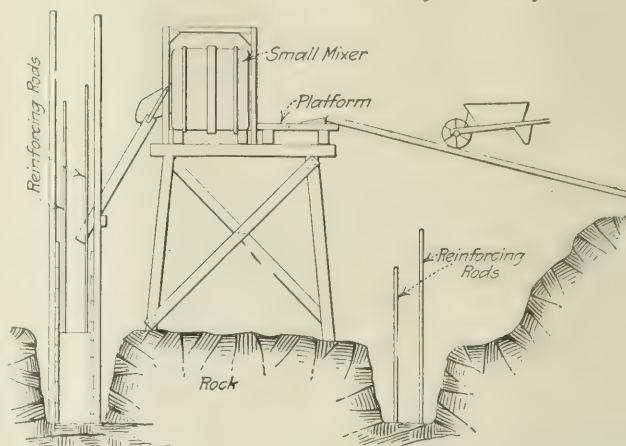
CONCRETING WALLS OF UNDERPASS THROUGH ROCK FILL
